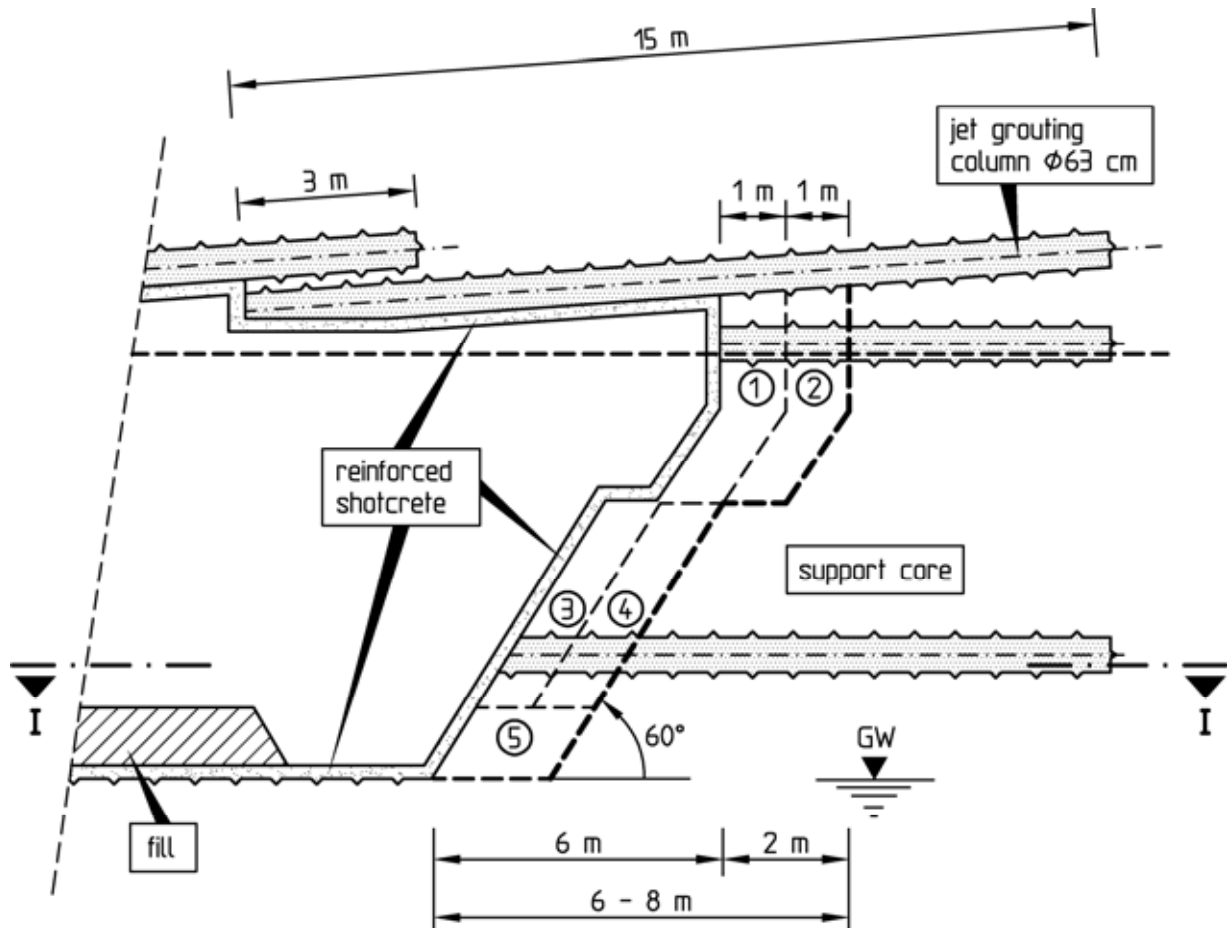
Stabilization of the tunnel face using jet grouting columns (not carried out)
